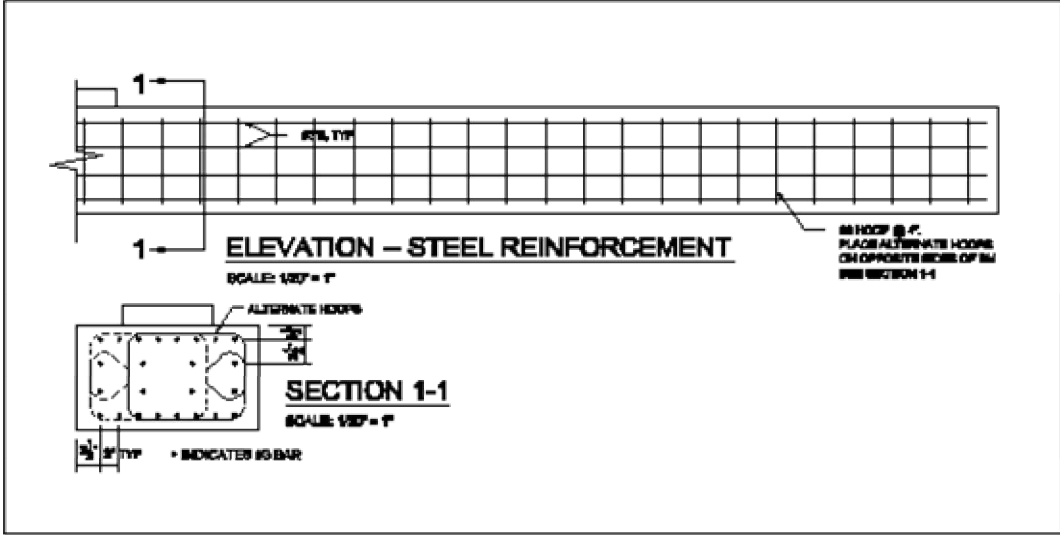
Reinforcing details for one side of AC specimen (Other side similar)
